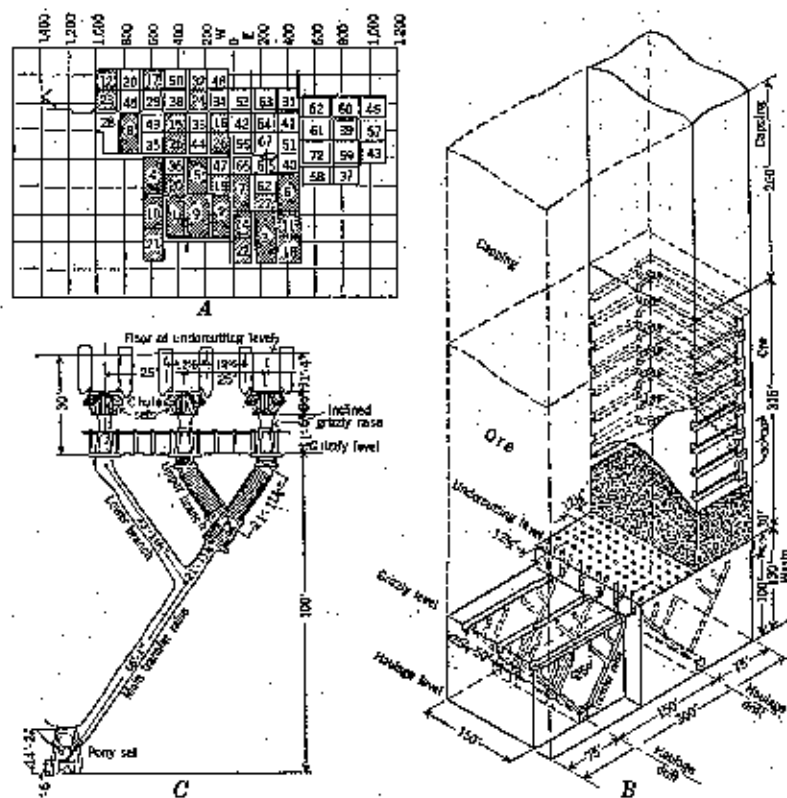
B.—Undercut block caving, individual stope system, Miami mine, Arizona: A, Plan of 510-foot boundary caving level showing order of mining stopes; B, Isometric drawing of 150 by 300-foot stope; C, detail of ore transfer raise system.
